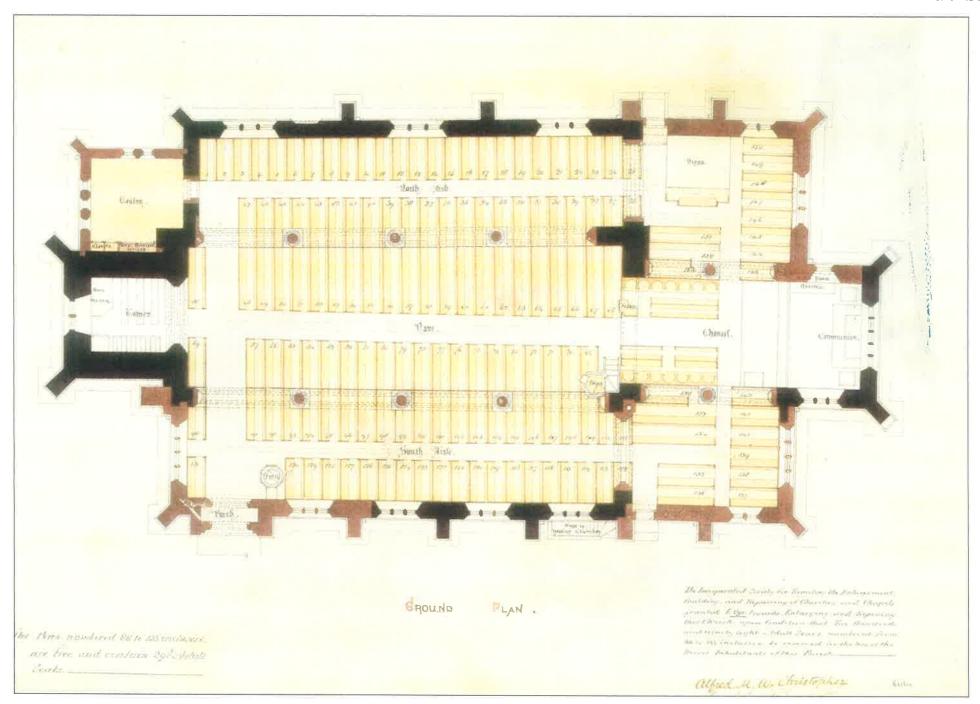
John T Christopher's plan 'Church of St Aldate as altered 1862-63' (new work in red)
